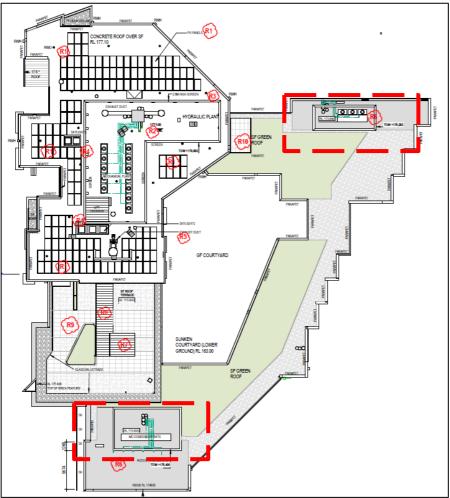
Proposed Plans – Roof Plan – Amendments Highlighted Source: Morrison Design Partnership Pty Ltd (Amended by Mecone)
